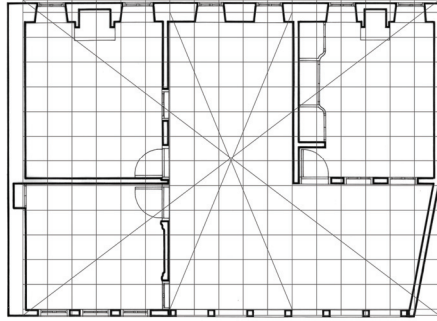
Upper storey plan of the house in Asklepion, Trikala
